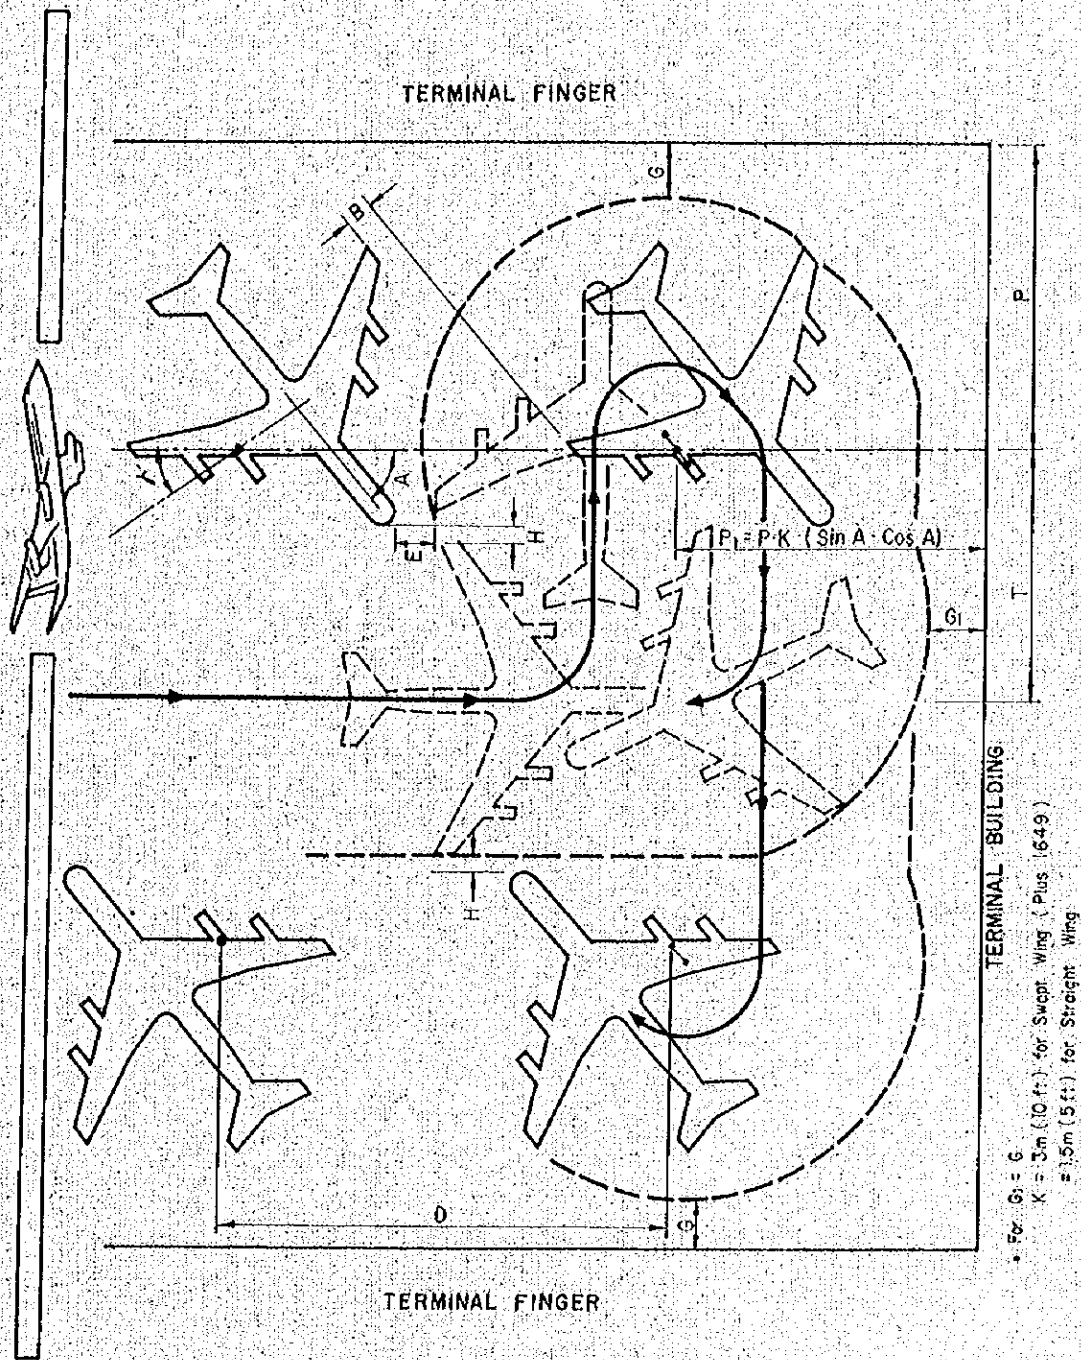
TERMINAL BUILDING APRON PARKING CONFIGURATION
